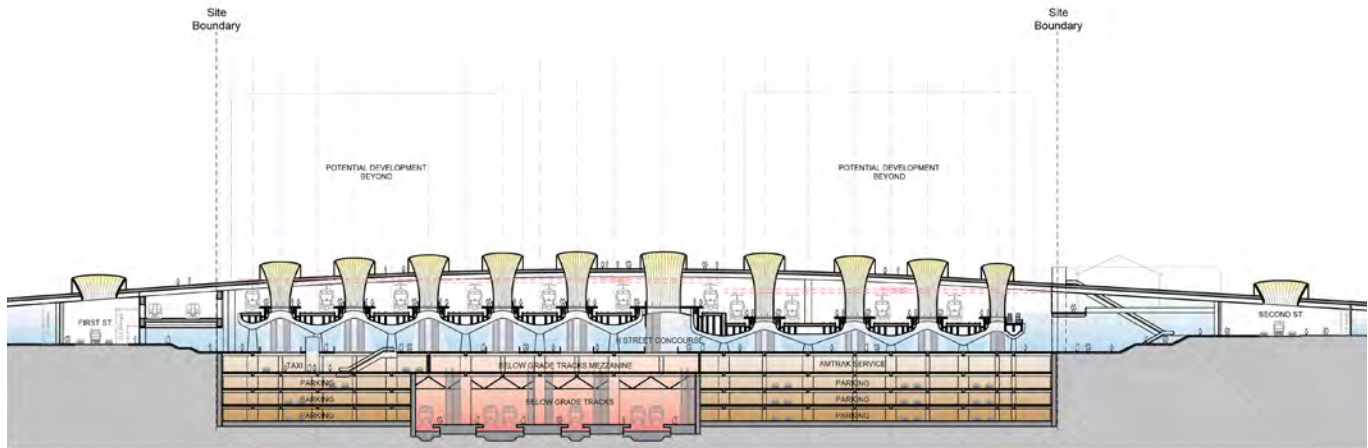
Transverse Section of H Street Bridge with Integrated light-wells within the central median
